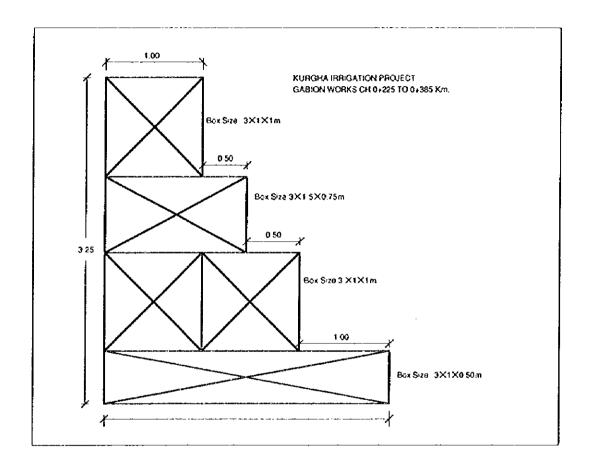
Cross-section of Gabion Revetment Wall
